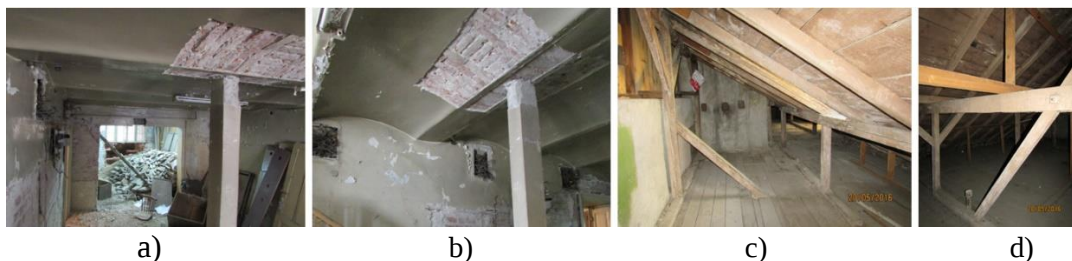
a), b) Floor area with structure of metal profiles and “vaults” (solid pressed brick); c), d) Roof structure [122]
